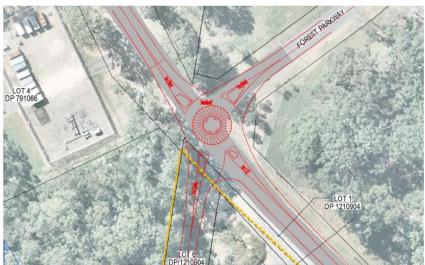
Forest Parkway 4 Leg Roundabout Concept Layout
